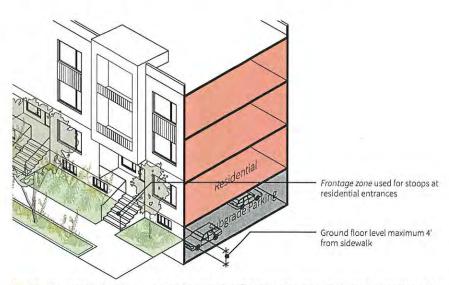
Elevate residential entrances up to 4' from the sidewalk and provide a minimum 3' deep frontage zone at all building entrances.
